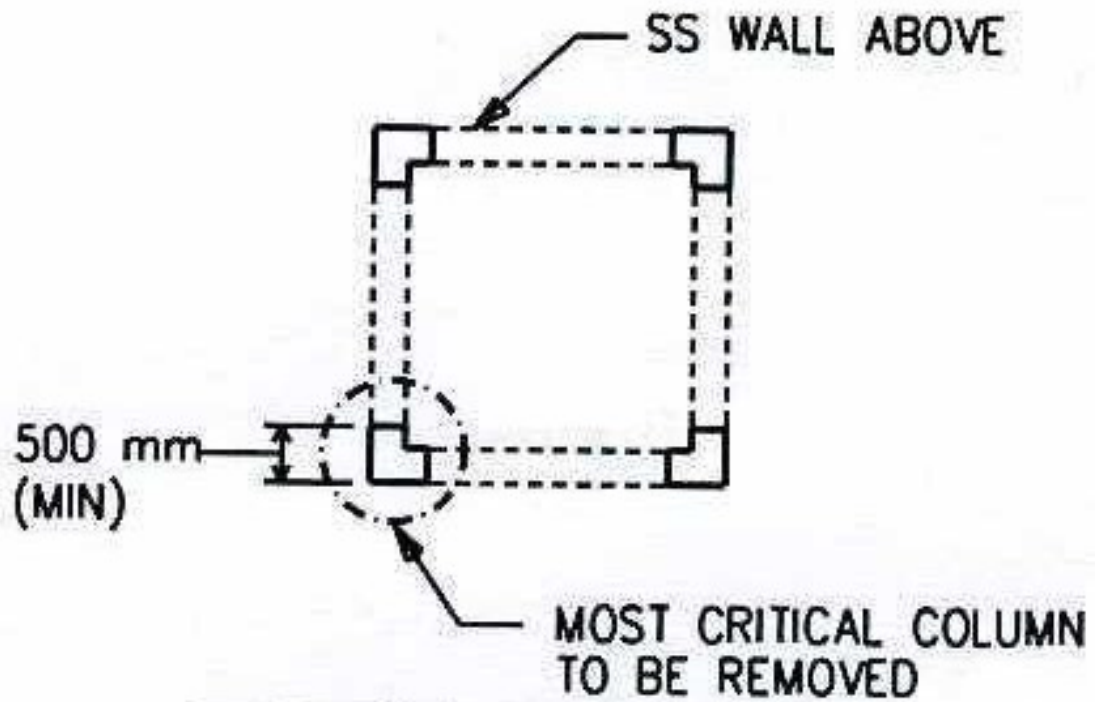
PLAN OF NS COLUMNS
